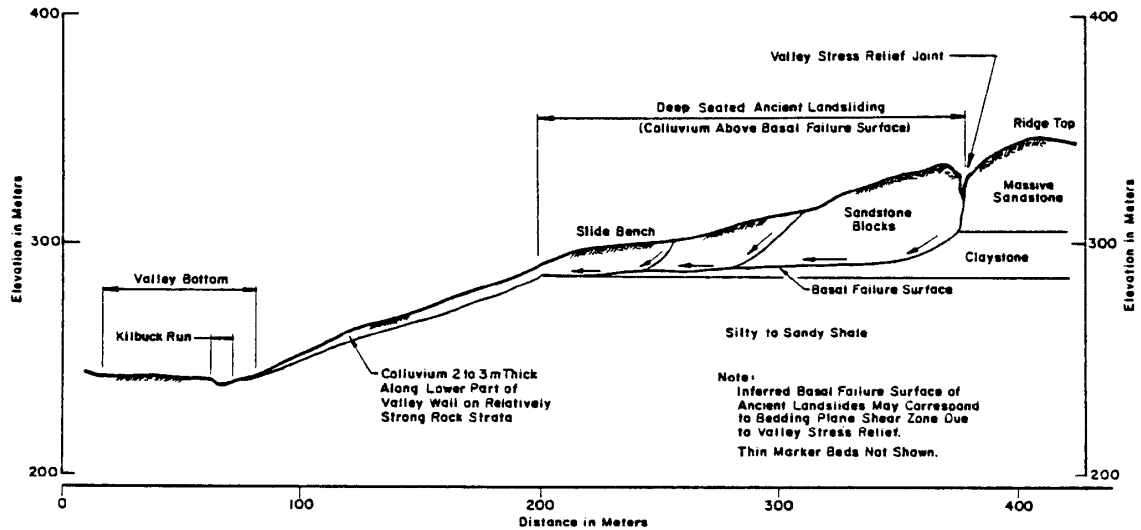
Generalized slope cross-section, Sta. 908. (Hamel & Adams, 1981)
